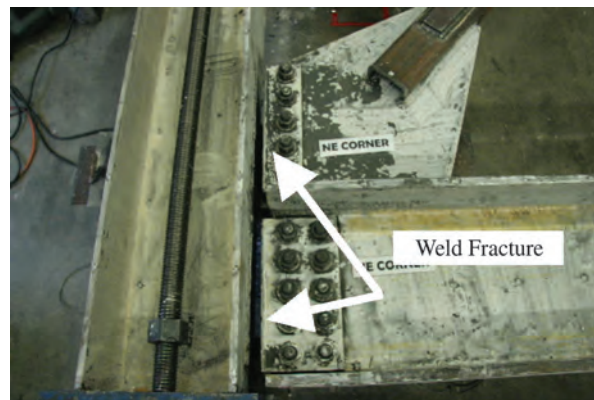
(a). Fracture of gusset-plate welds designed by stress.
